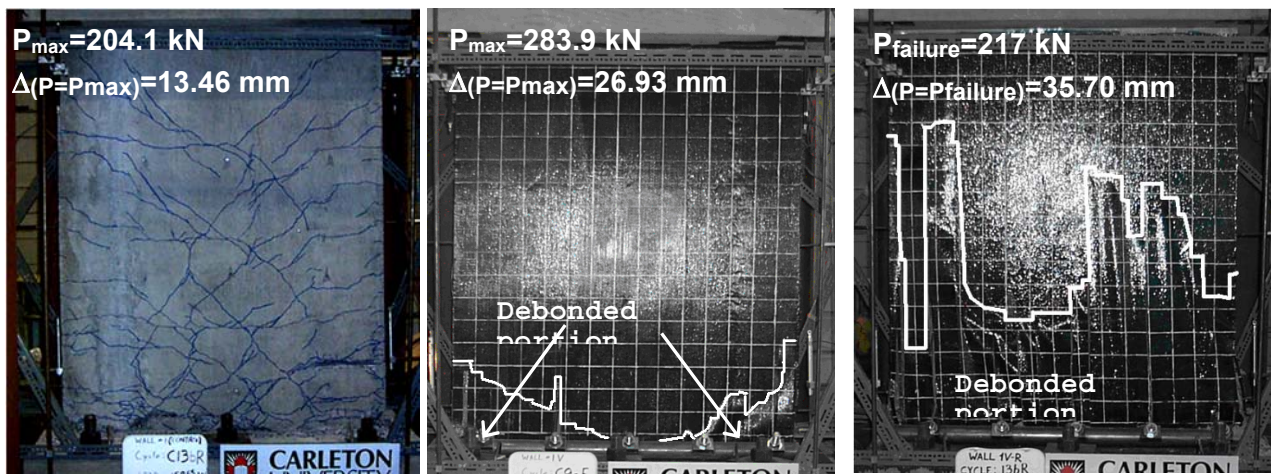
Left to right: crack pattern in specimen CW-2; RW-2 specimen at maximum load; RW-2 specimen at failure load.
